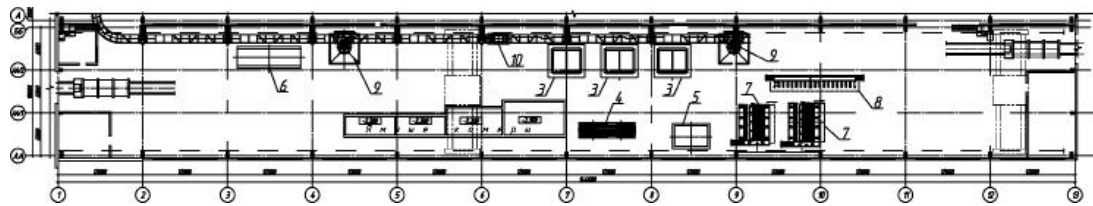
forming Plan of span No. 4 (3rd launch complex): 1– cassette unit for the production of ventilation units (existing); 2 – cassette installation for the production of Elevator shafts (existing); 3 – cassette installation for the production of Elevator shafts (project); 4 –cassette installation for the production of staircases; 5 – conductor for the Assembly of reinforcement cages; 6 – vibratory platform; 7 – cassette installation for the production of ventilation units (project); 8 – post lubrication and storage of punches; 9 – post reception of concrete mixture from Kubel; 10 – Kubel concrete transportation
